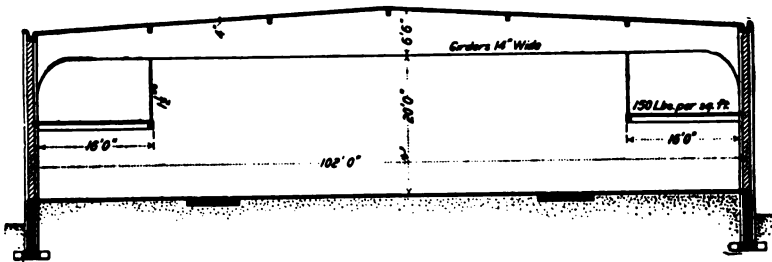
Roof for Fireproof Warehouse at Los Angeles, Cal.
